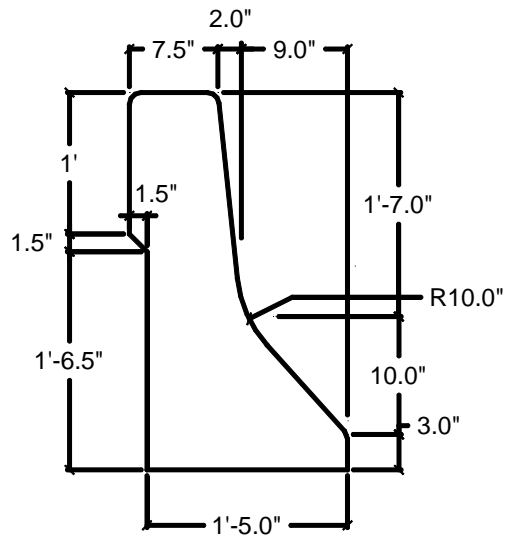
Curb Detail for the Lake LBJ Bridge
